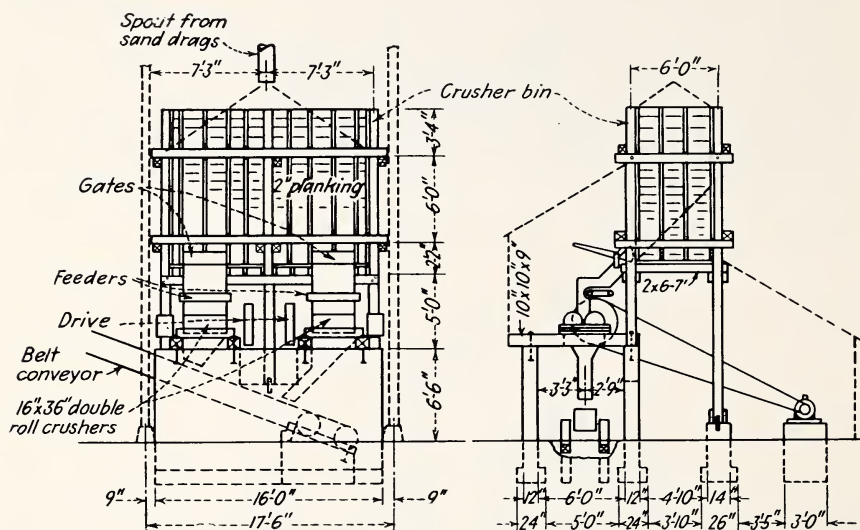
LAYOUT OF PLANT TO CRUSH PEA GRAVEL INTO SAND.
